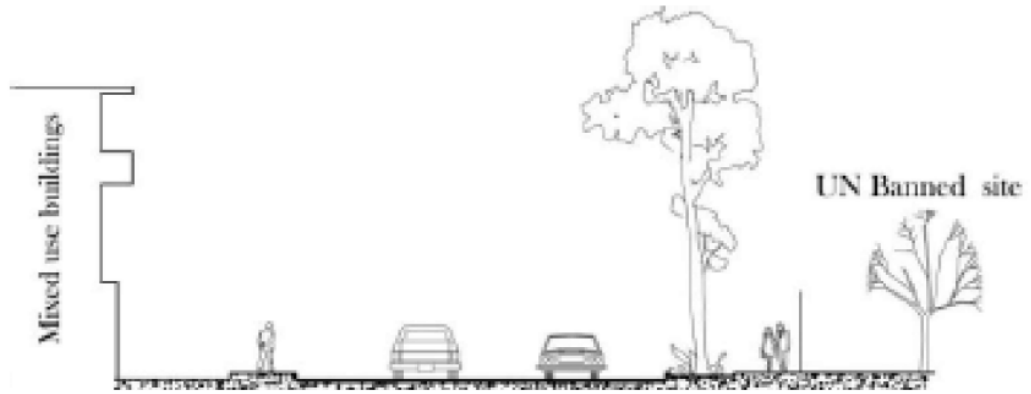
Section showing tight pedestrian walk way. In addition to damaged surfaces, height irregularities and differentiation, sidewalks have also been blocked by trash and shop wastes and construction materials as displayed in Figure 3.15.
